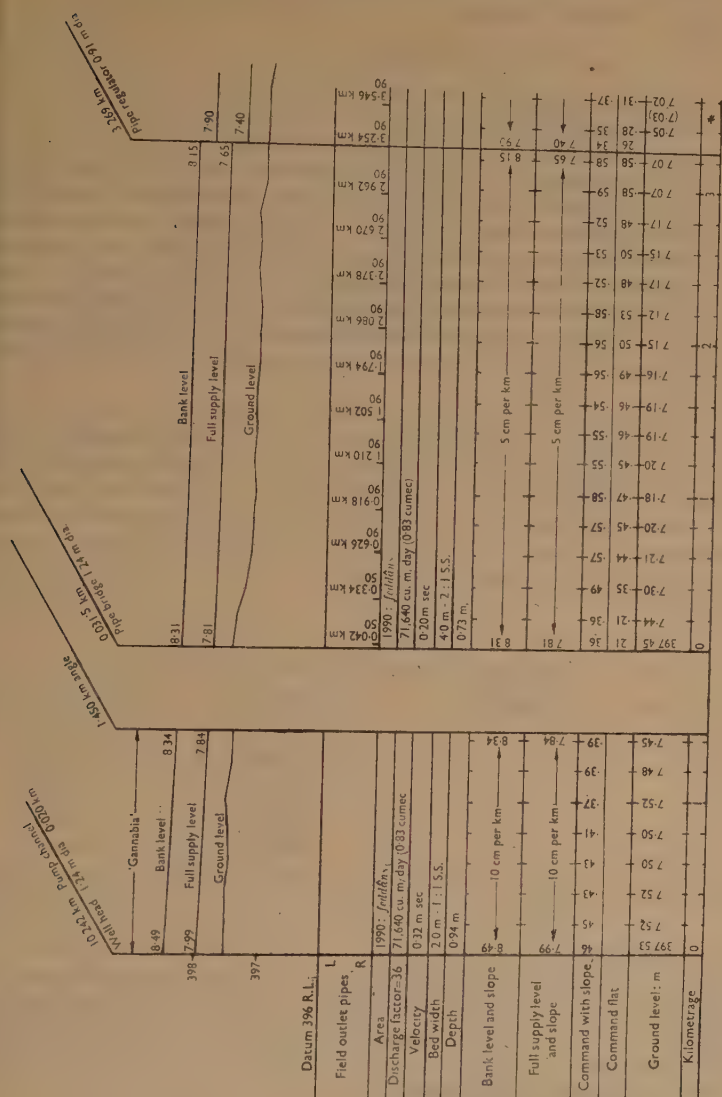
MINOR CANAL: PART LONGITUDINAL SECTION
